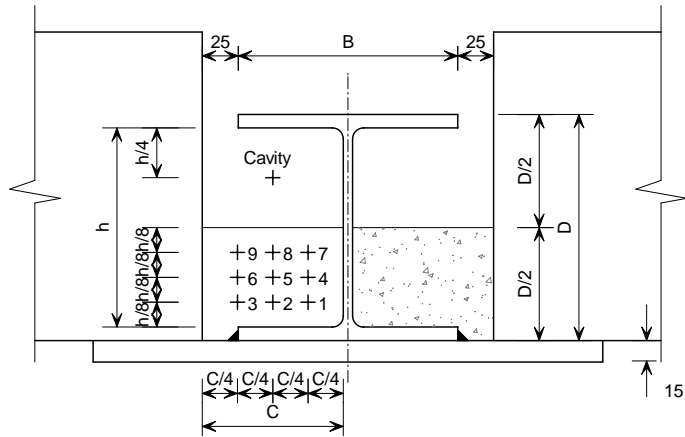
Transverse arrangement at position 5 and 7 (concrete thermocouples)
